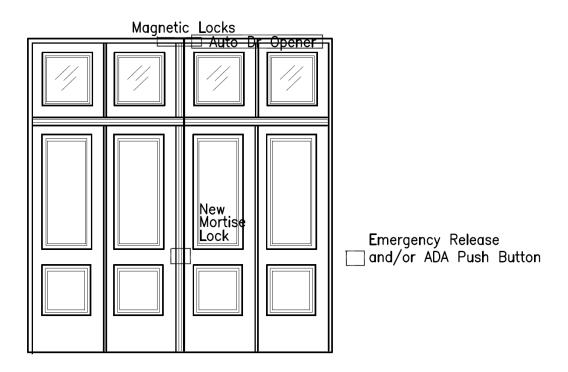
Northern door showing proposed ADA automatic door equipment.
